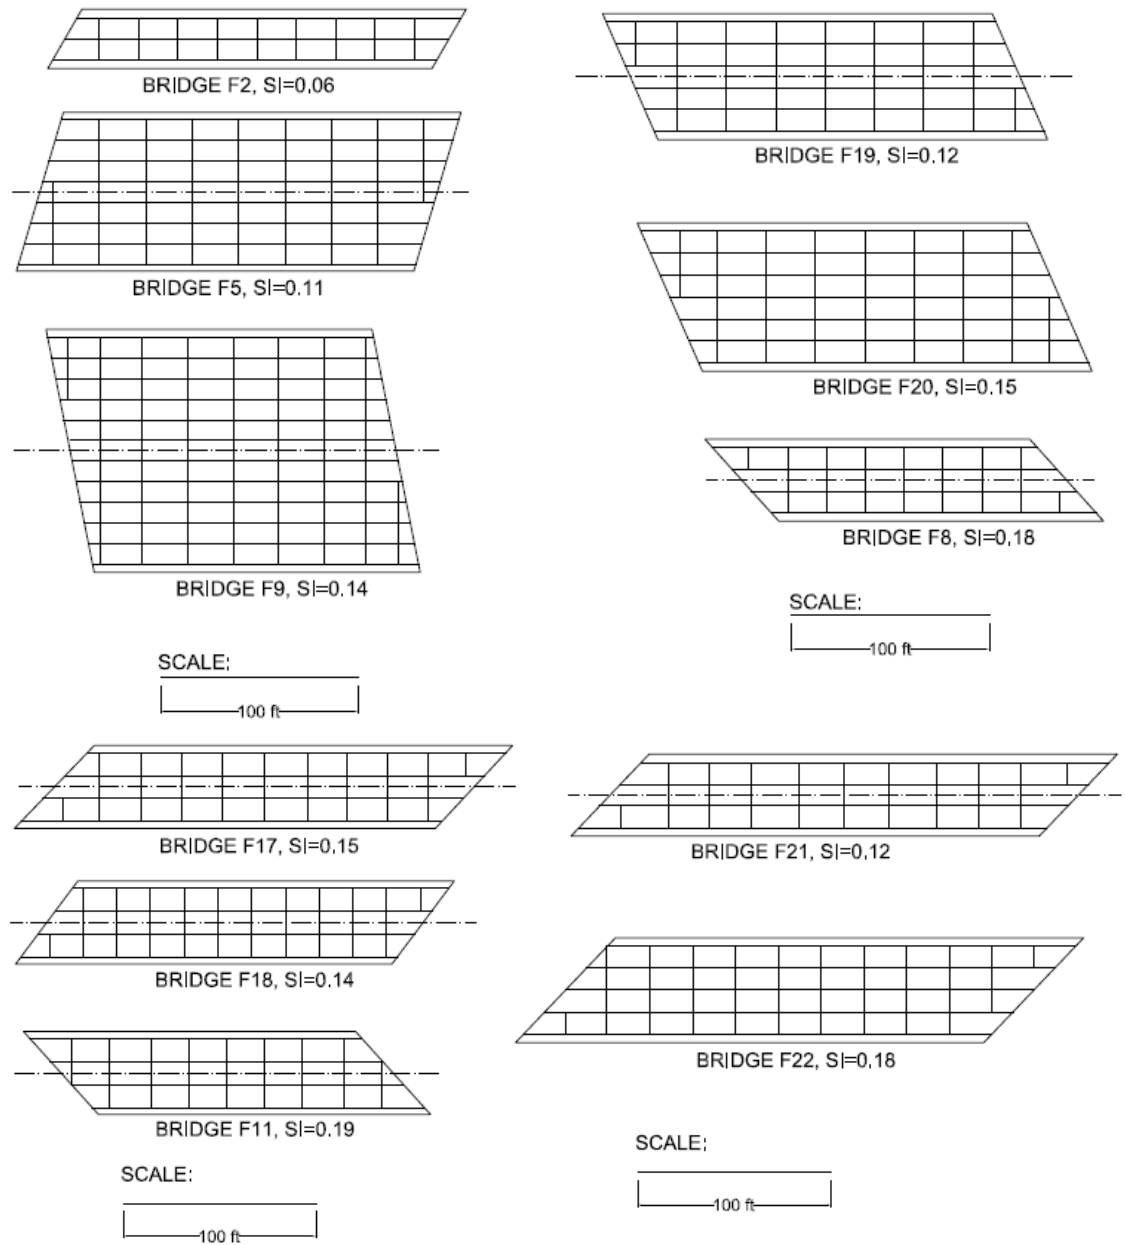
(contd.). Other simple-span bridges having contiguous cross-frame arrangement.
